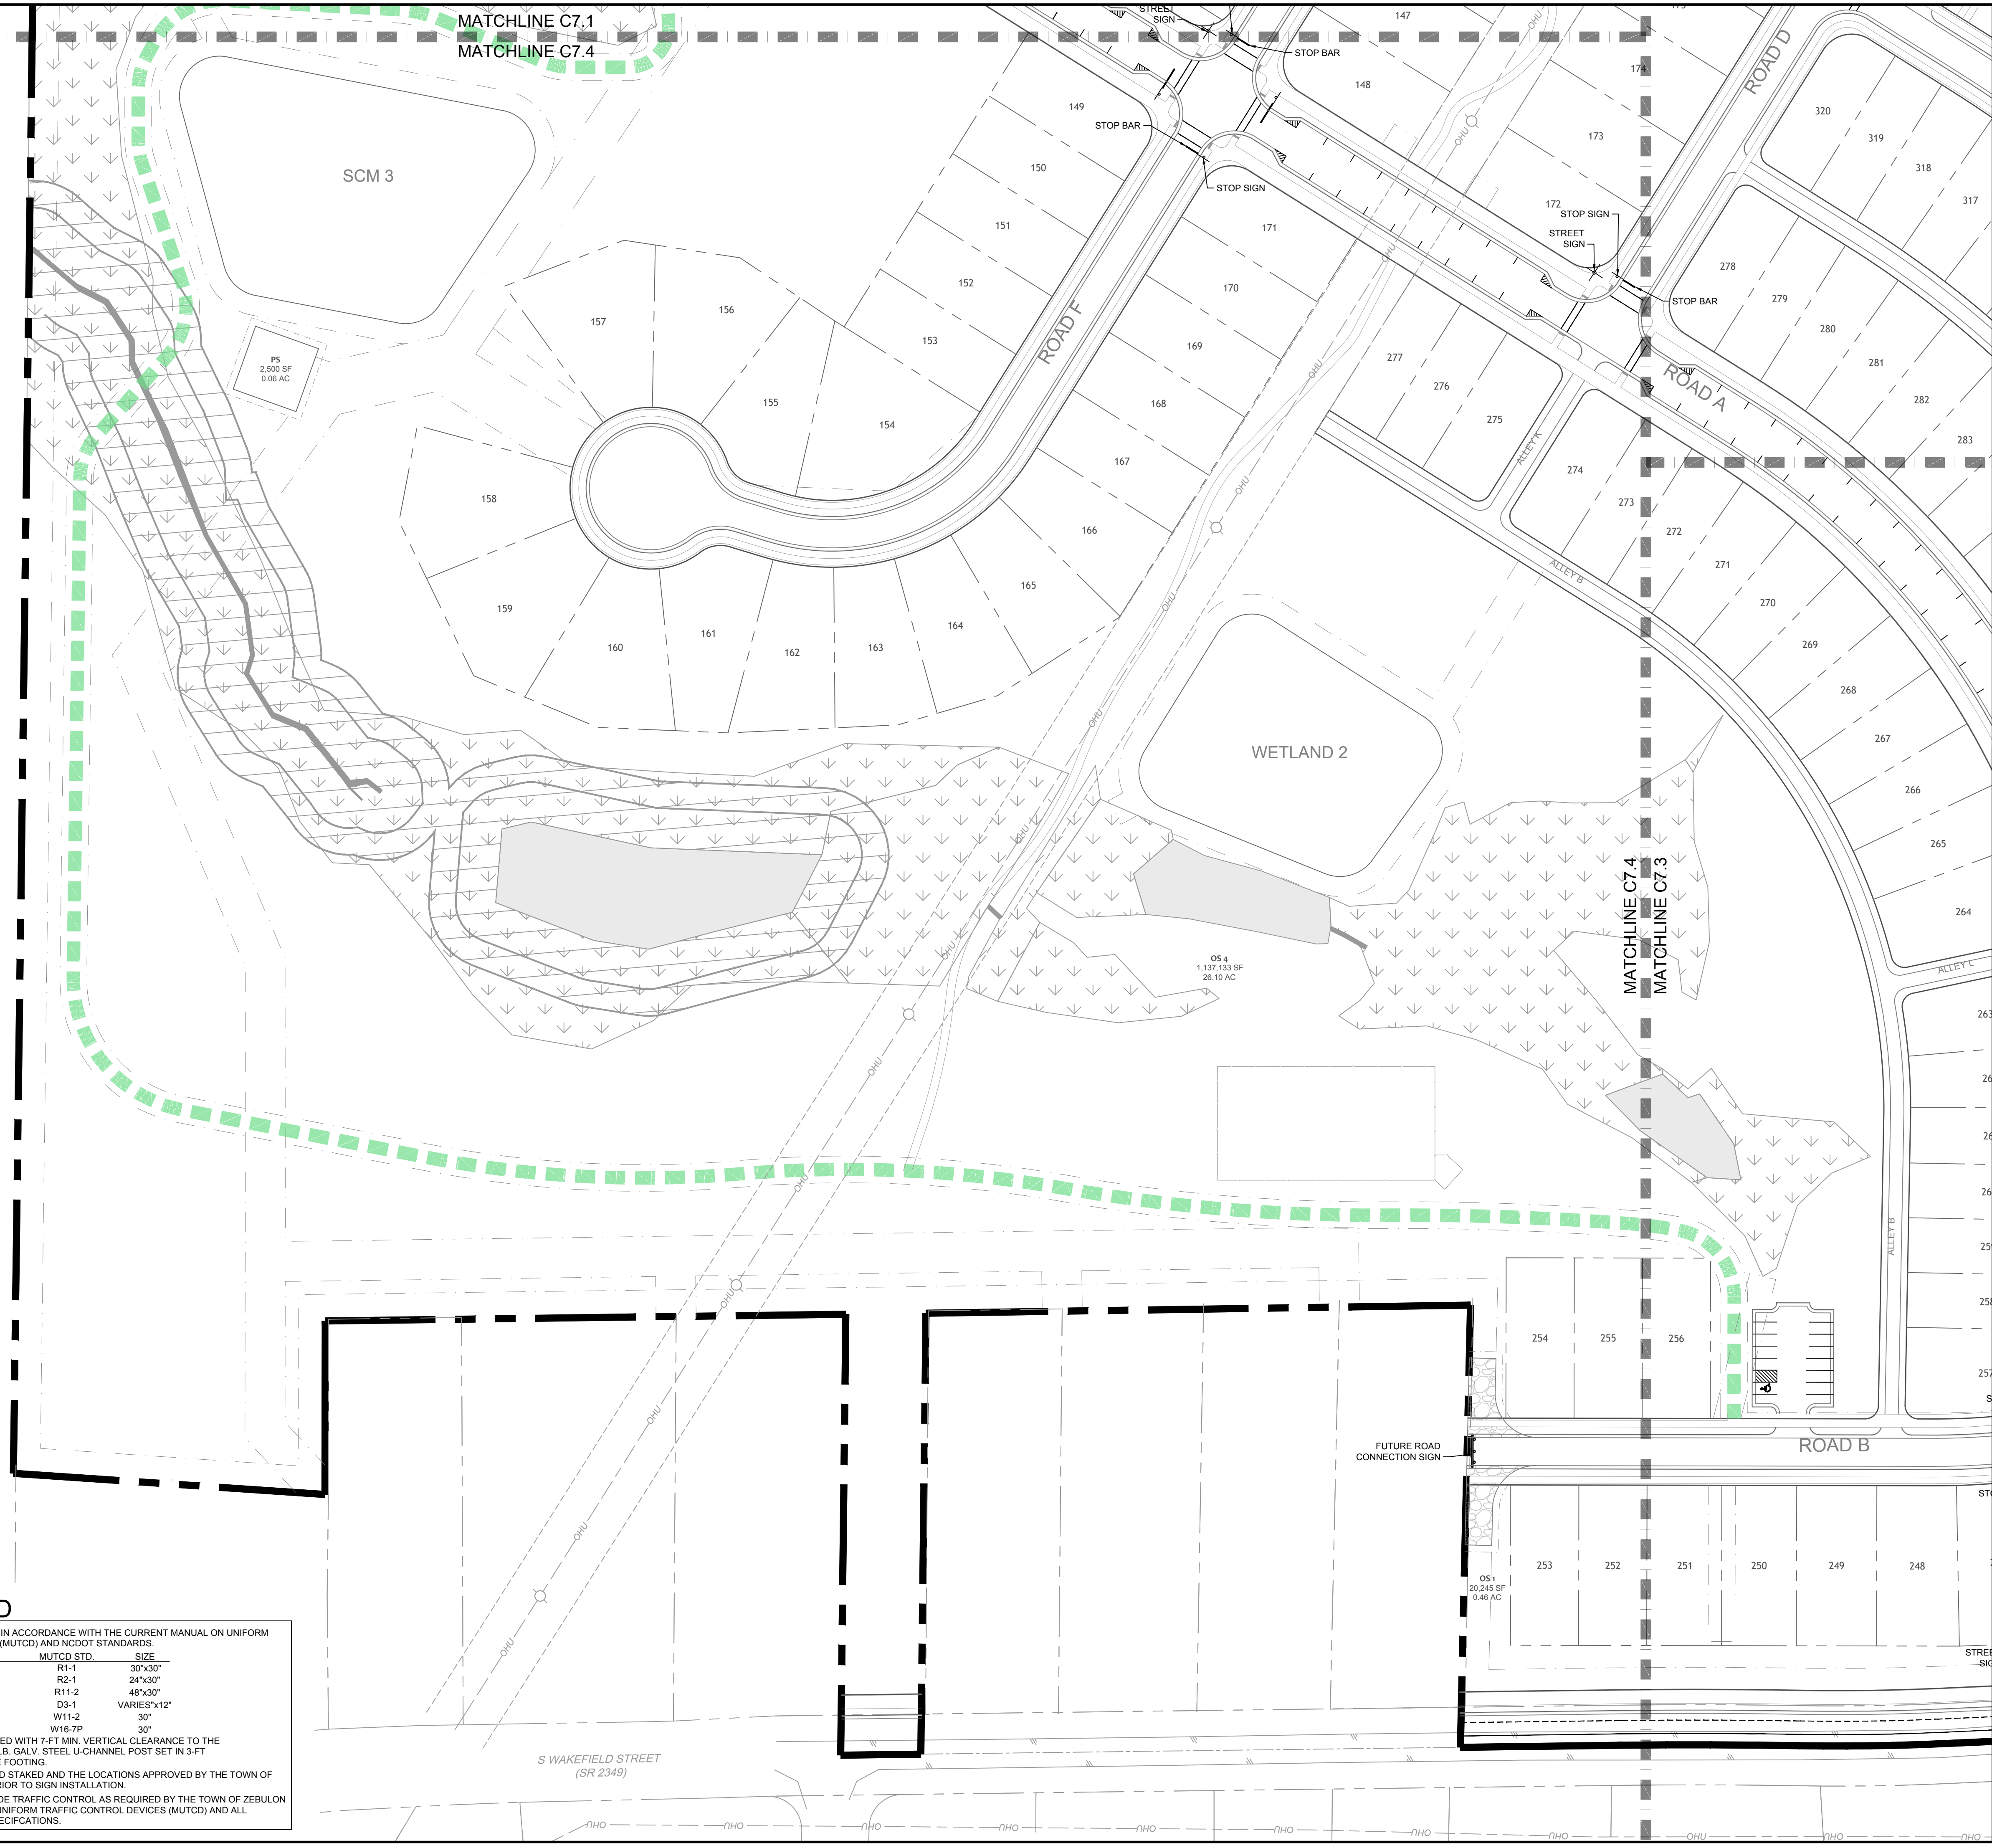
DETAILED SIGNS & MARKINGS PLAN SHEET 3 OF 4
